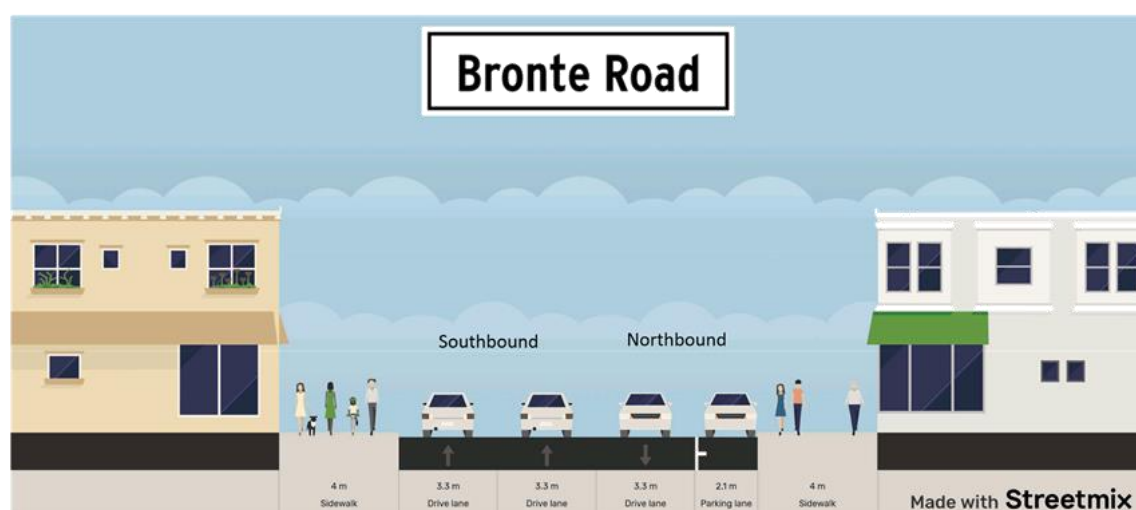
Cross Section of Existing Bronte Road (16 Bronte Road)
